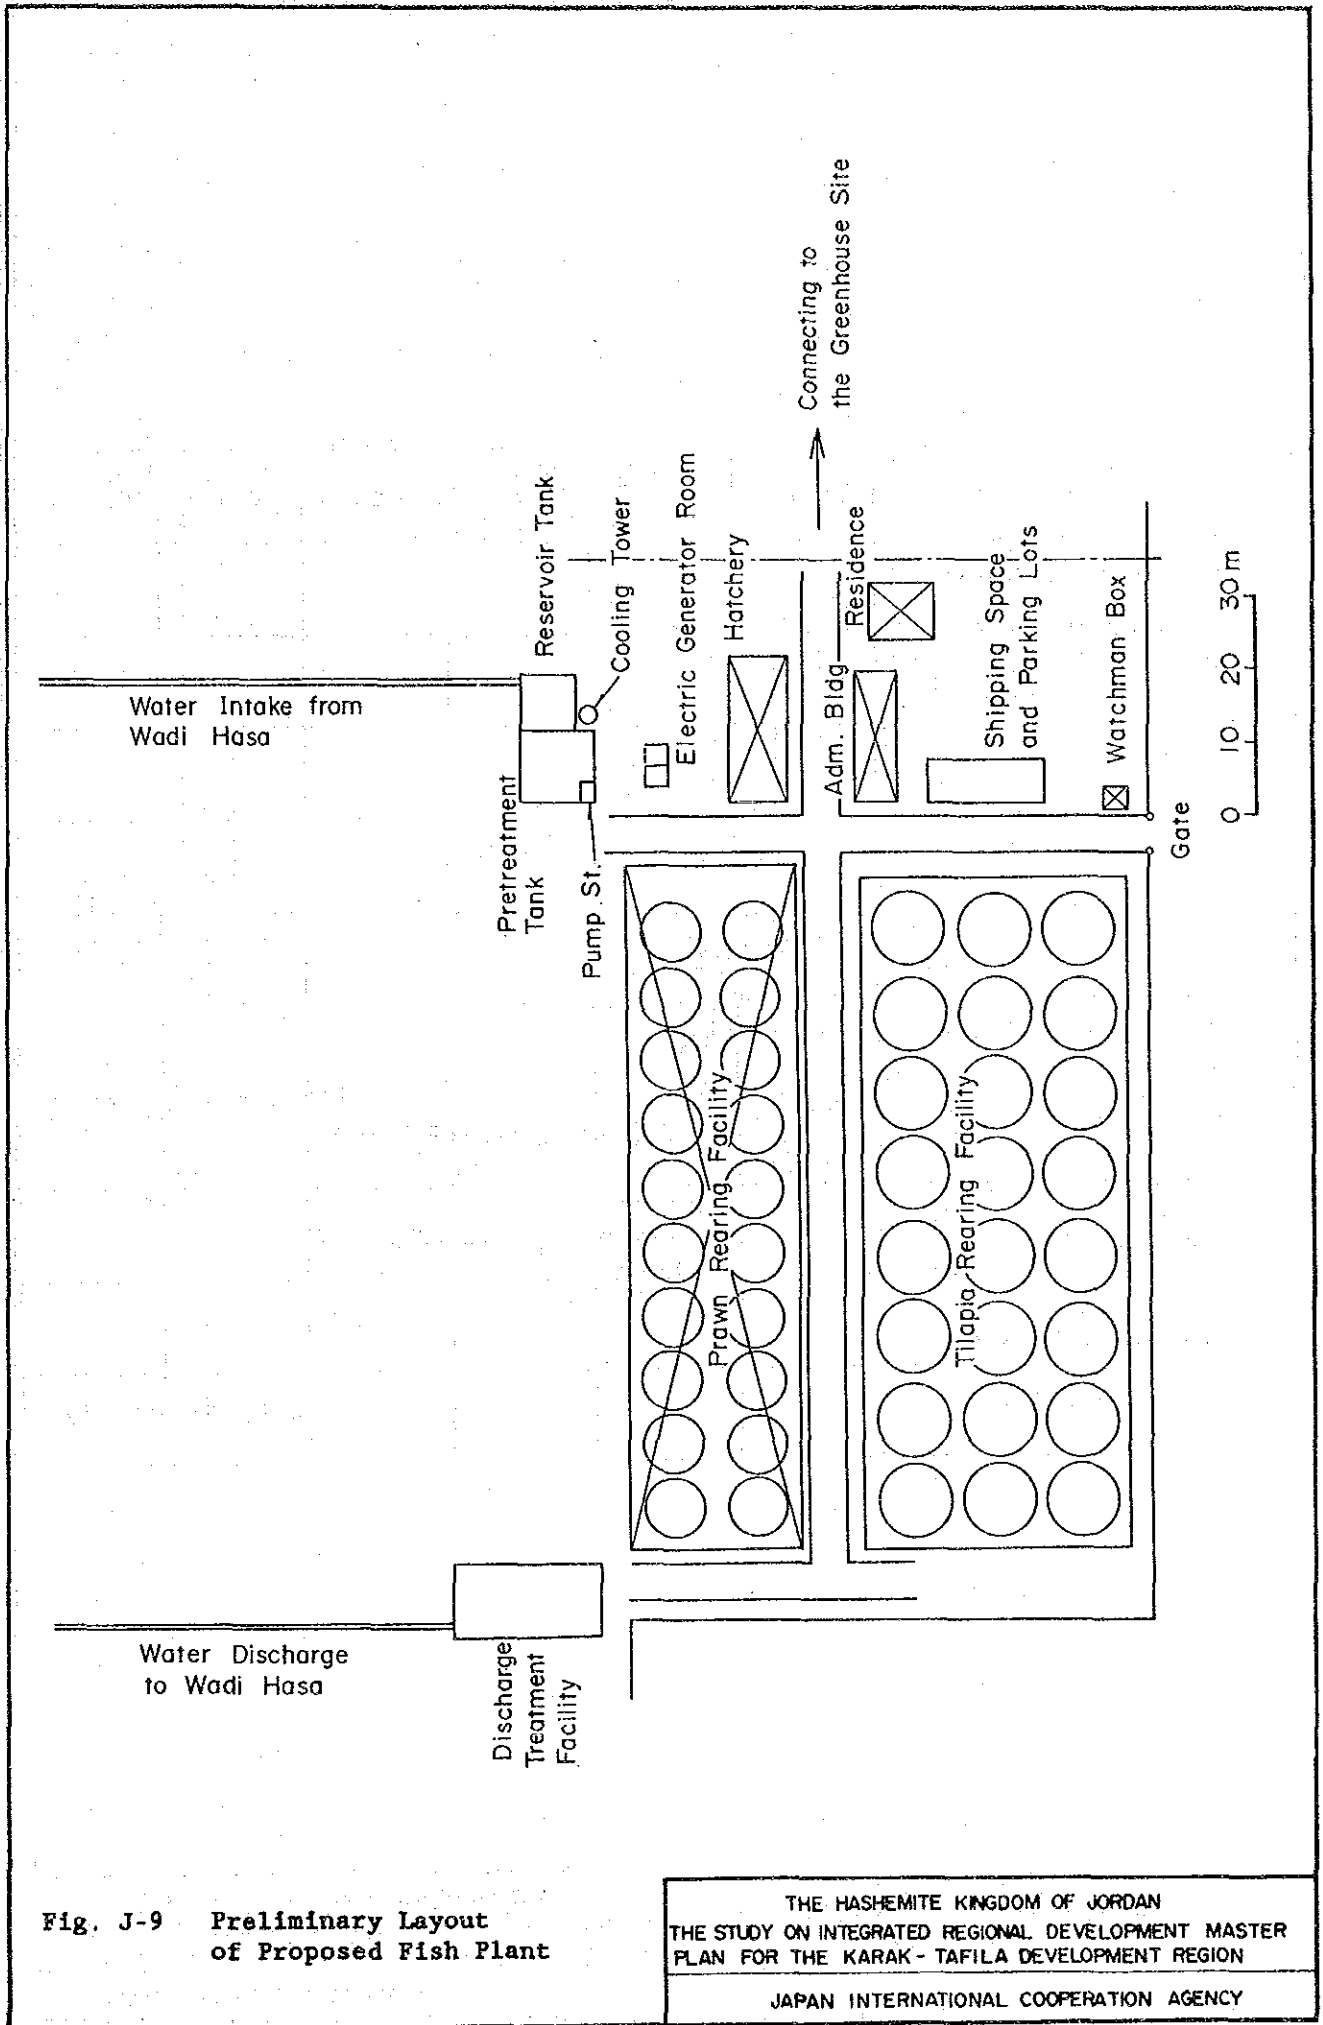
Preliminary Layout of Proposed Fish Plant
